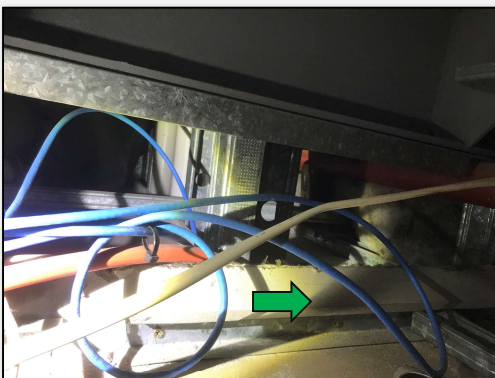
Level 32, internal, ceiling in front of dumb waiter - non-asbestos insulation.
